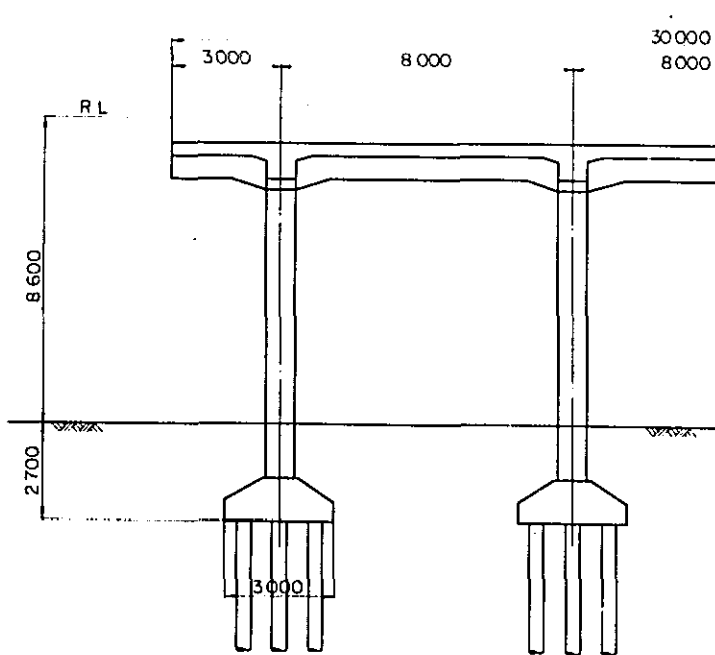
Standard Design of Rigid Frame Reinforced Concrete Elevated Station - Separate Platform
